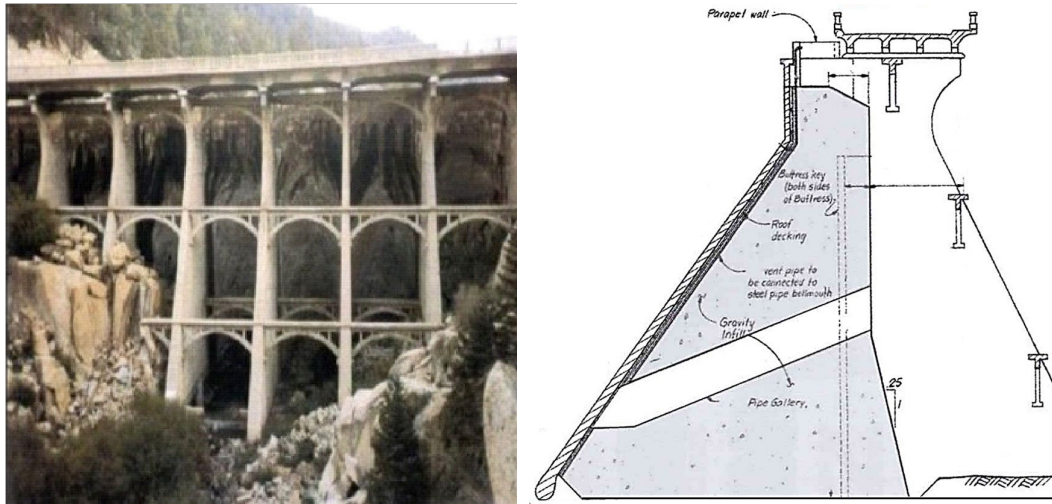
The Big Bear Dam: vertical section of the structure being filled with massive concrete.
